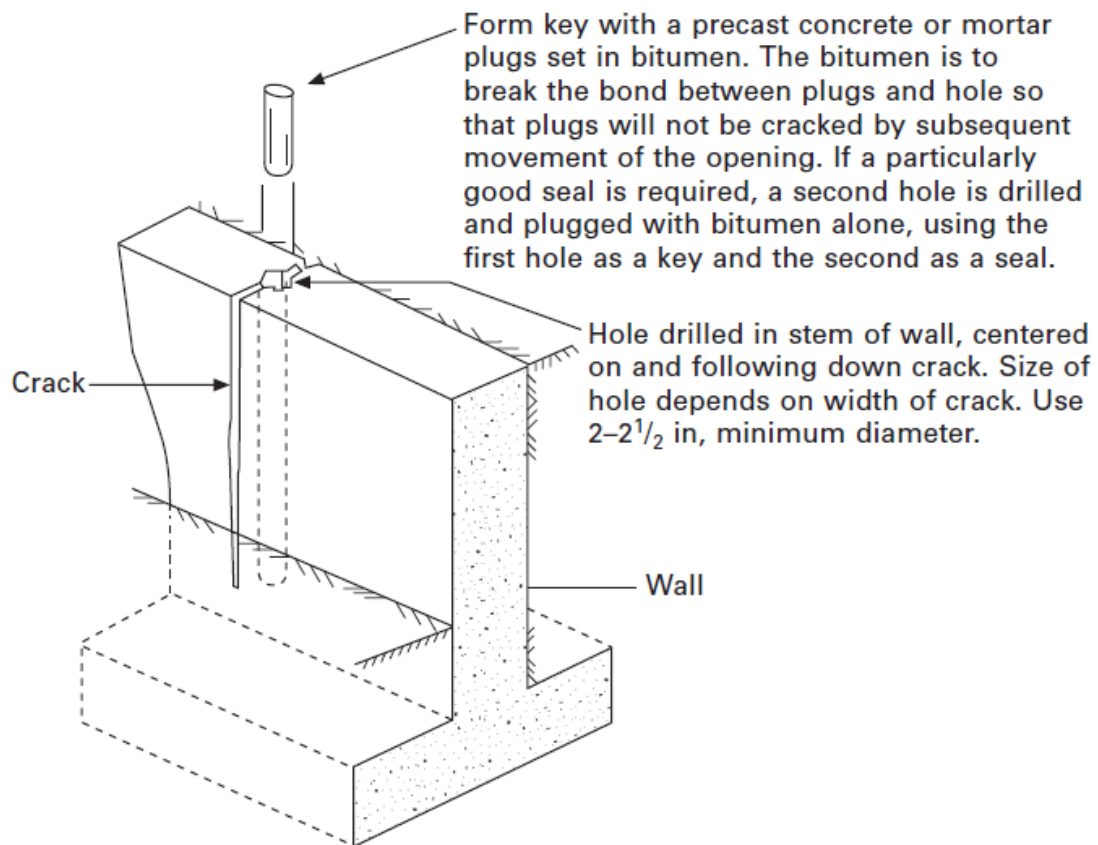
Repair by drilling and plugging (ACI Committee 224.1R).
